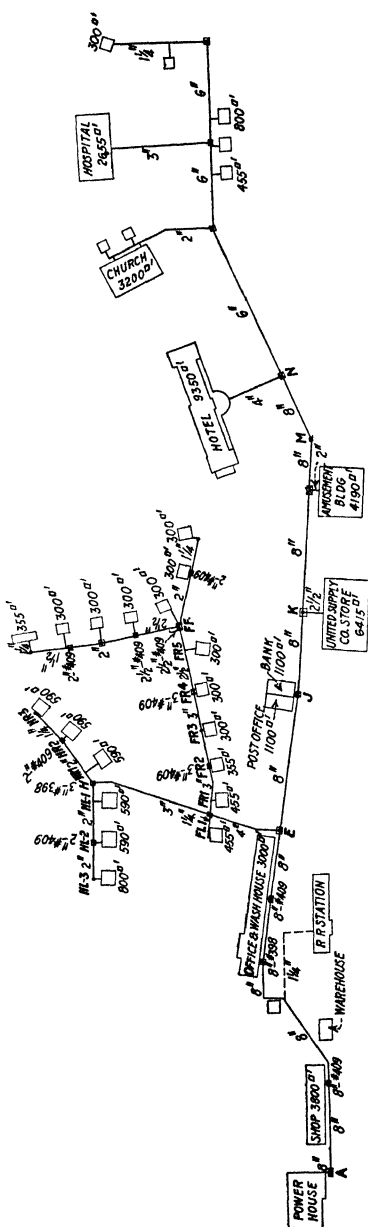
CONDUIT LAYOUT FOR CENTRAL STATION HOT-WATER HEATING SYSTEM.
